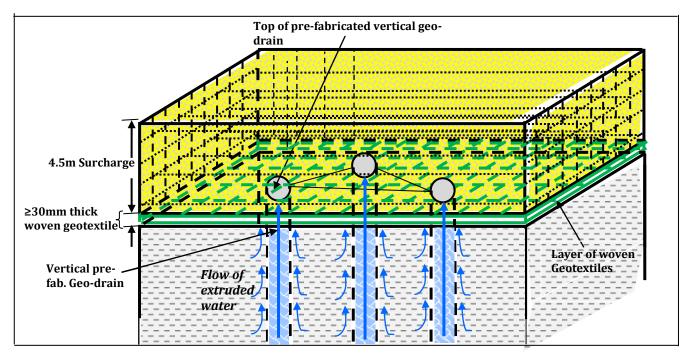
Emplacement of Woven Geotextiles before placement of Surcharge on the Road Alignment
